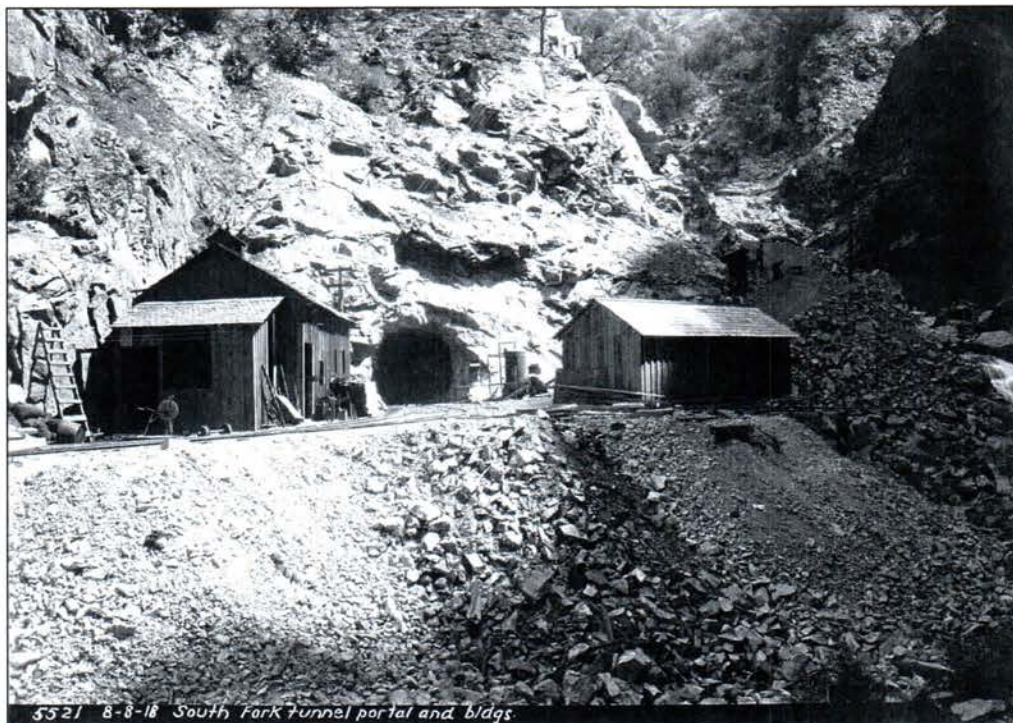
August 1918 photograph showing South Fork Adit on north side of river and camp buildings prior to construction of the piped section of the Mountain Tunnel (c. 1921-1924). Note the old South Fork Access Road alignment at far right and the railroad track and ballast at center.
